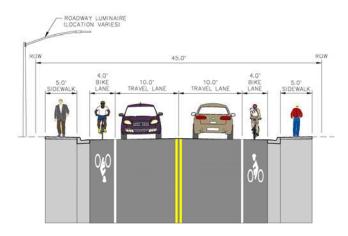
W. 30th Avenue (Spenard Road to Arctic Boulevard) - Alt. B
